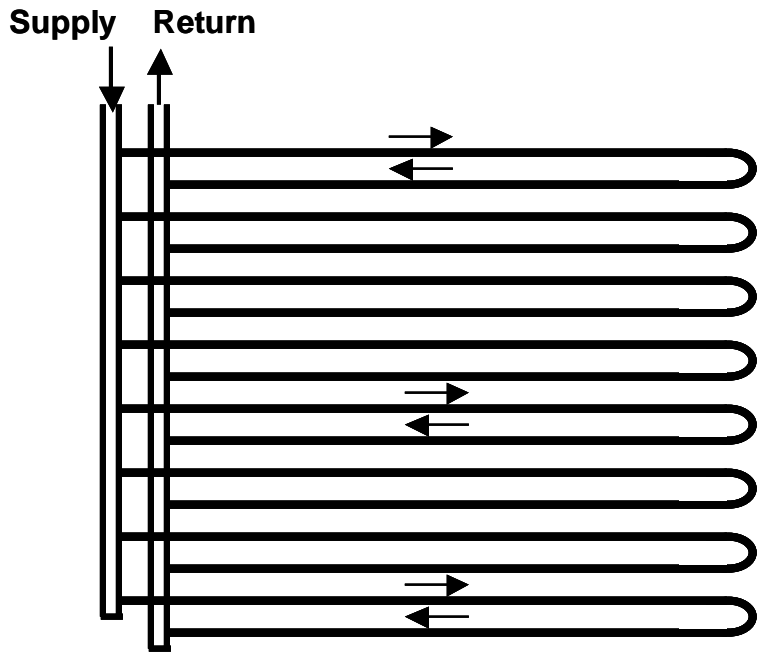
Typical bench top heating system with EPDM tubing placed 2 inches on center (drawing not to scale).
